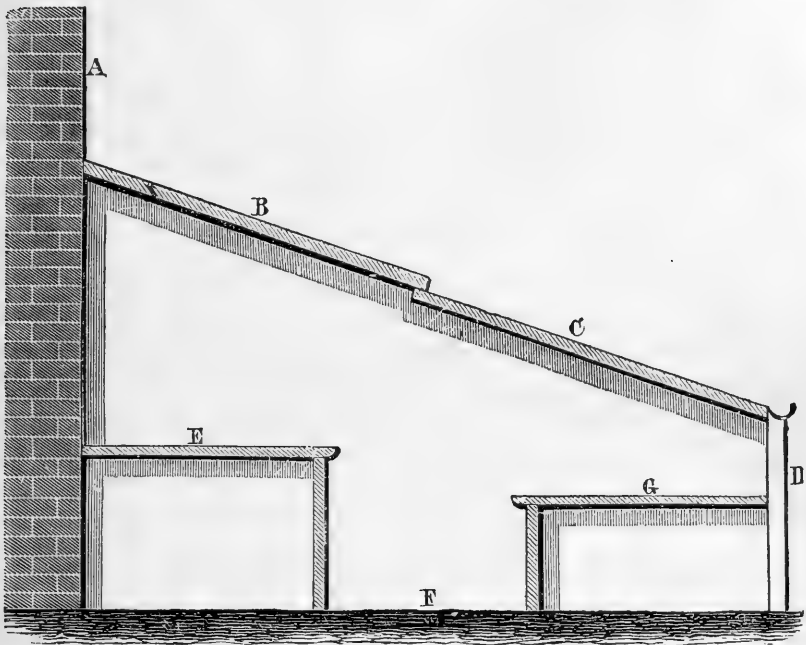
SECTION OF A CHEAP GREENHOUSE.
